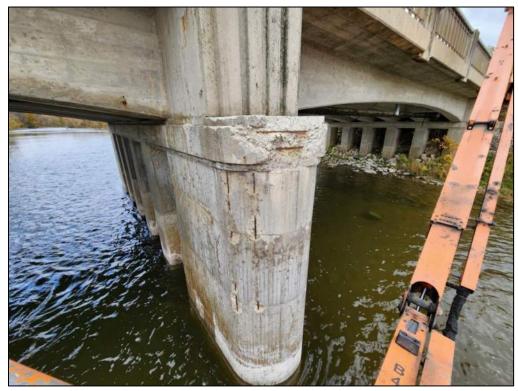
Pier 3 – South Face (cracks, spall with exposed corroded rebar and delamination)
